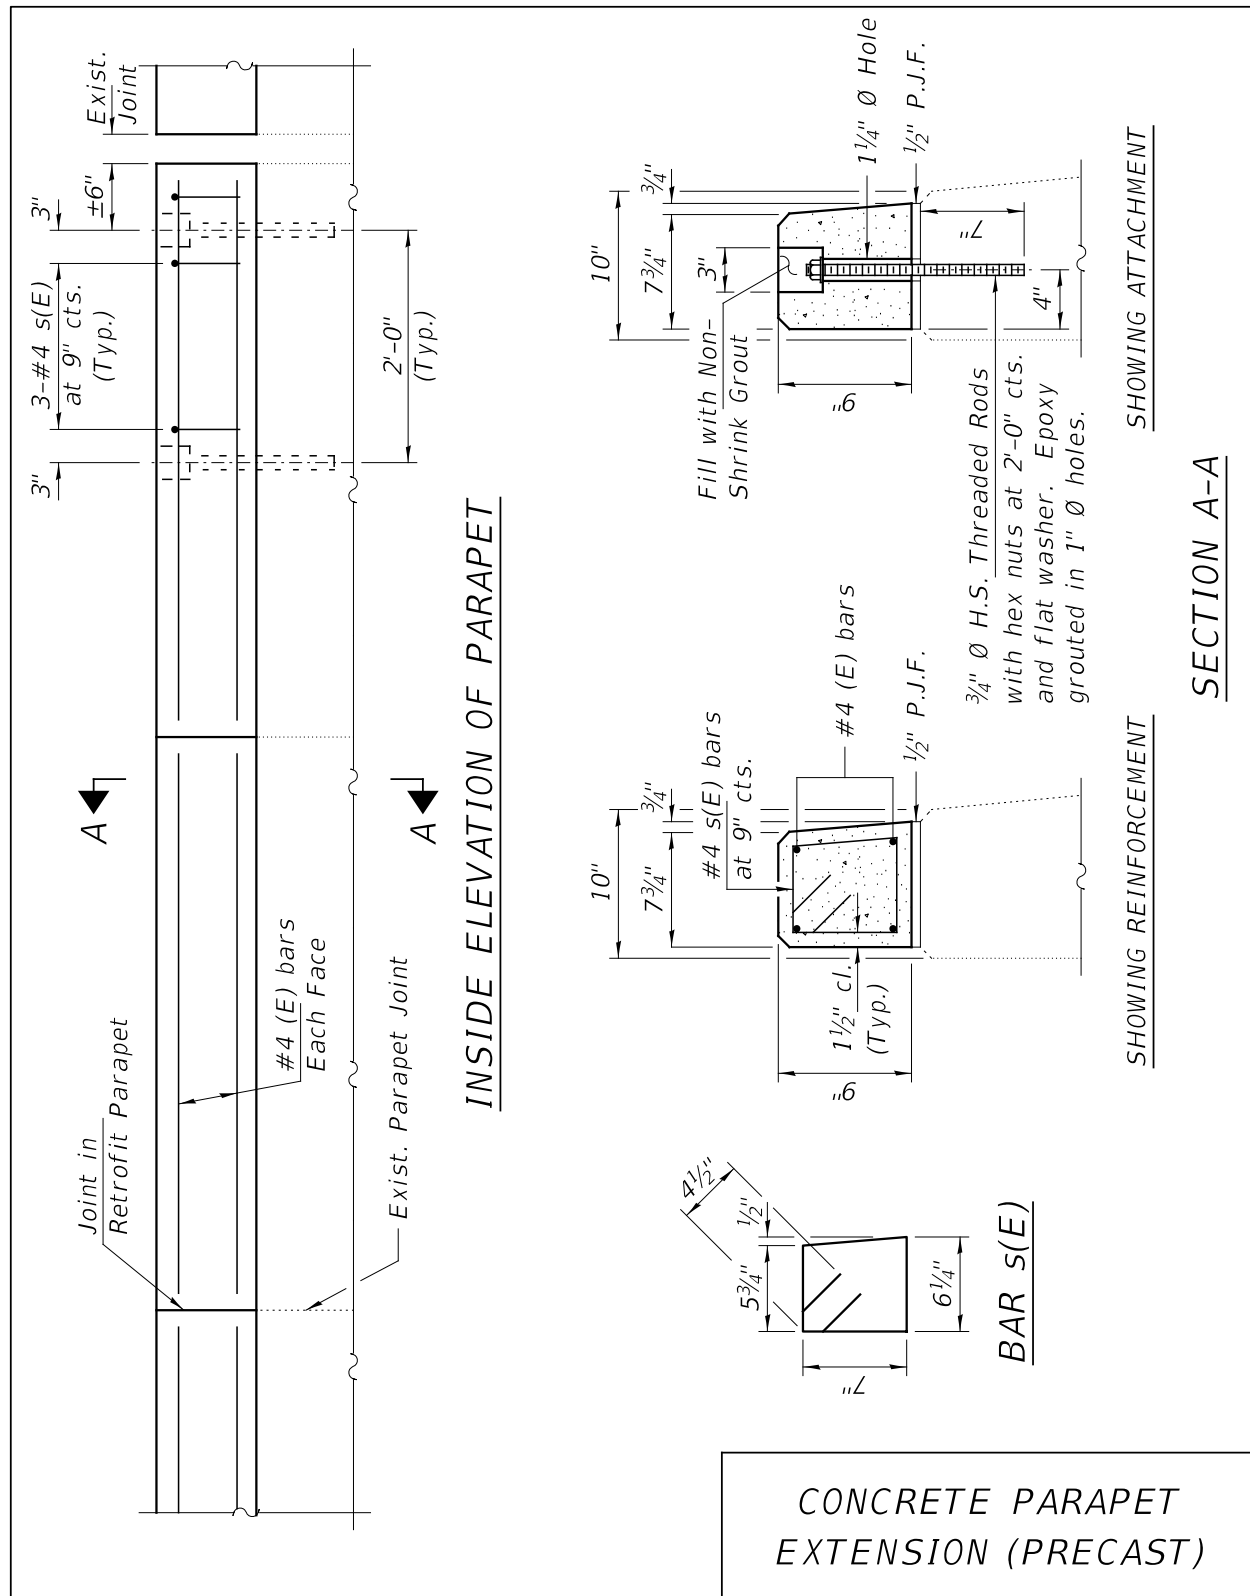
Concrete Parapet Extension (Precast)
